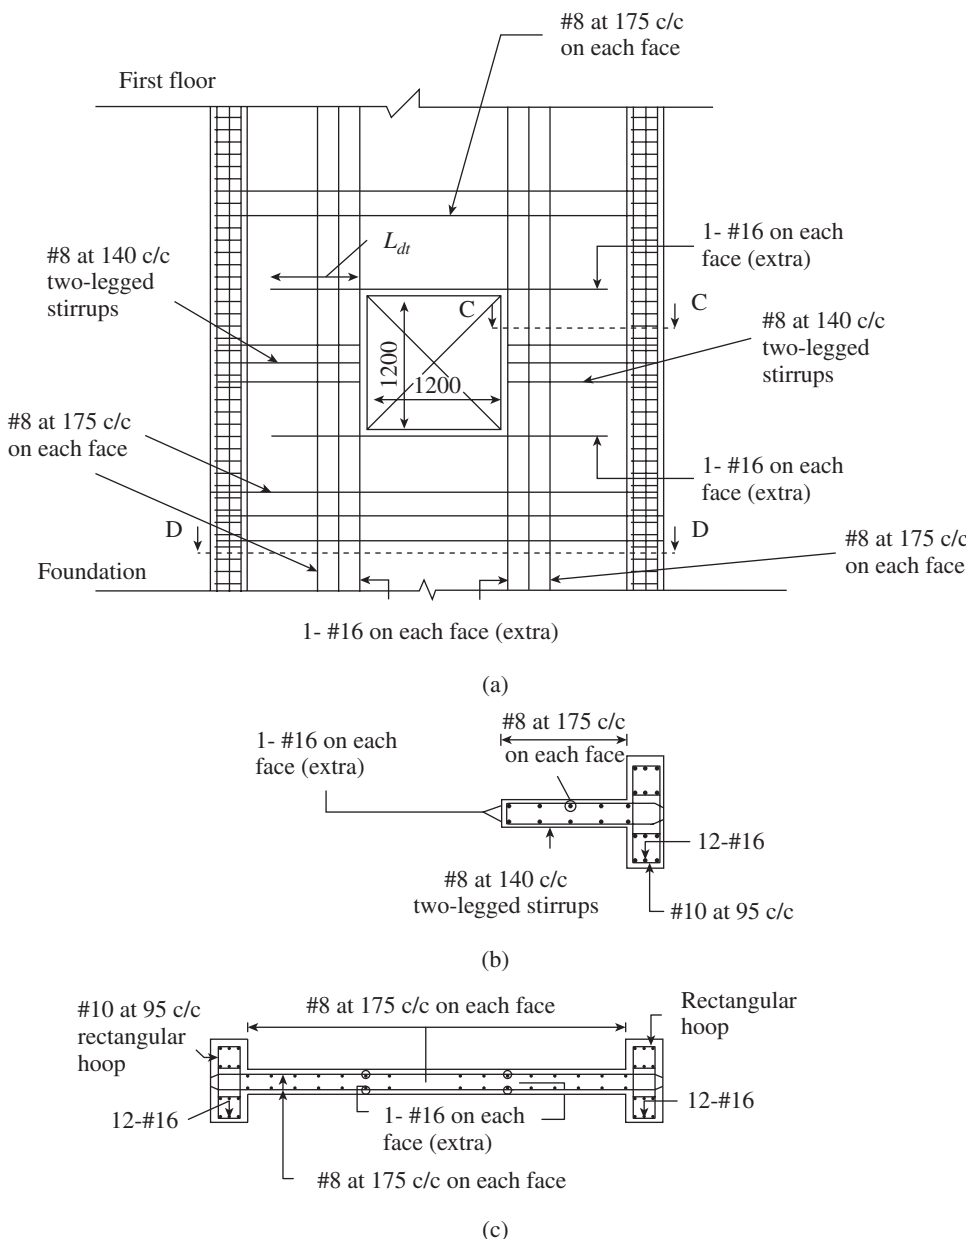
Detailing at openings in structural walls (a) Elevation (b) Section C-C (c) Section D-D
